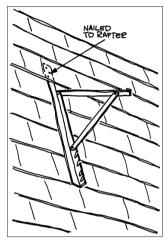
Adjustable roof brackets used with 2x10 planking are convenient and safe on sloped roofs. Locate them over rafters for secure nailing.
